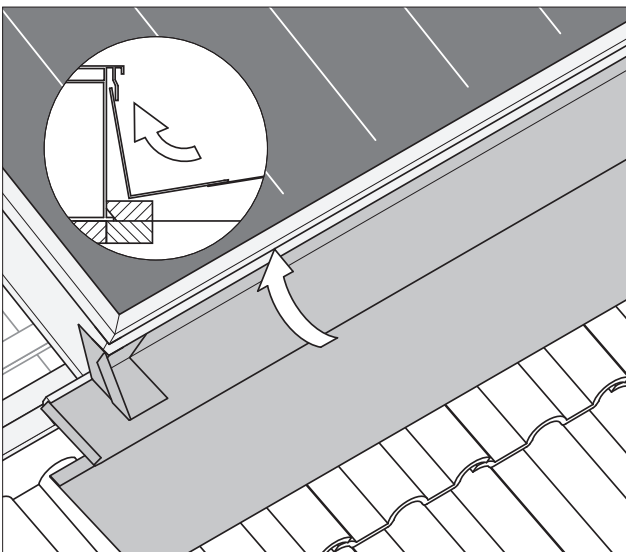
Insert lower aluminum panels into the deeper rear groove of the collector frame (see highlighted details). Proceed the same way with the corner edges.
